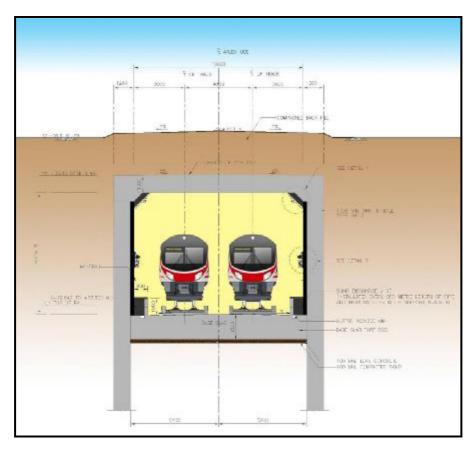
Typical Section of Underground Structure underneath the Area of Department of Highway
